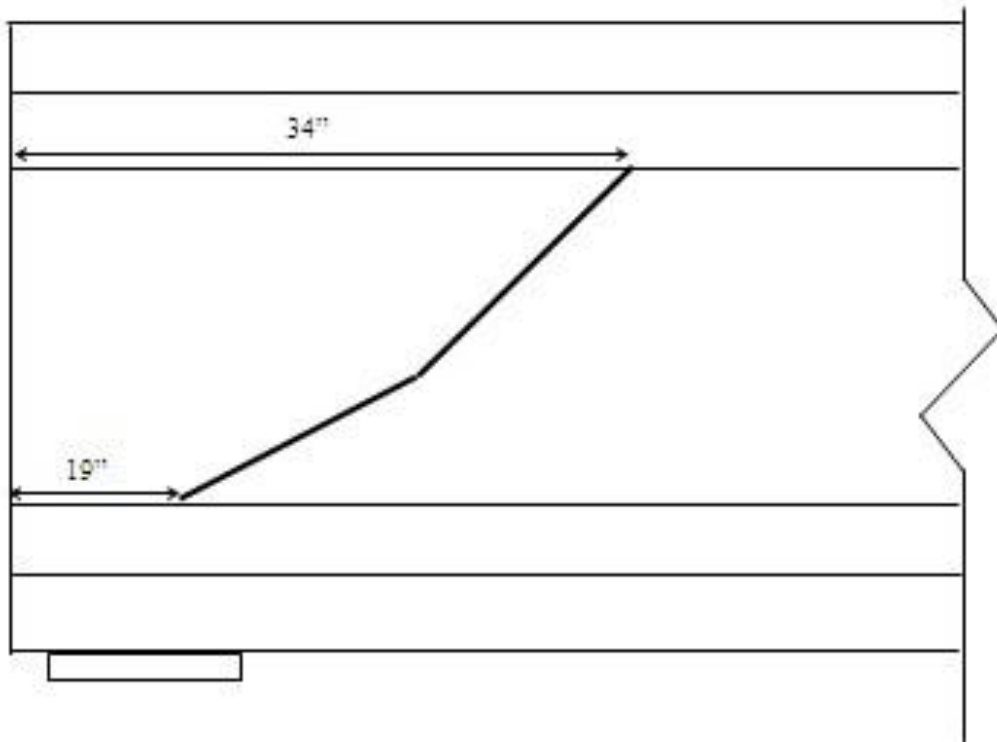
Crack diagram for south span girder, 7th beam from west side, east face, south abutment (#7933).
